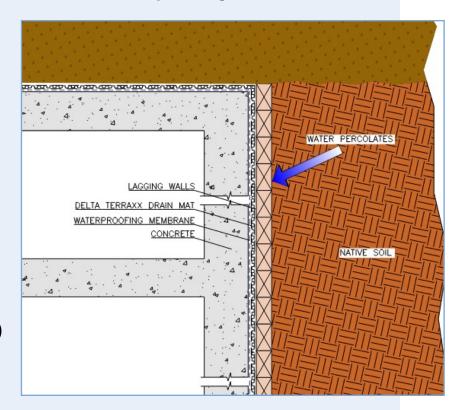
Blindside Foundation Wall Waterproofing
